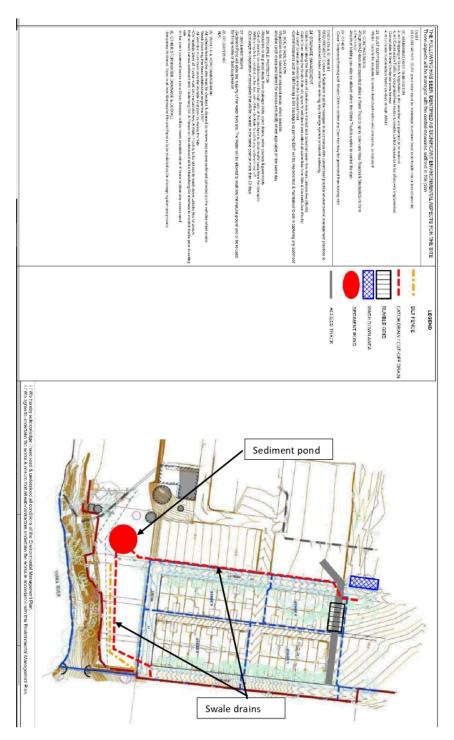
extract from CSC Civil Construction "Construction Management Plan)
